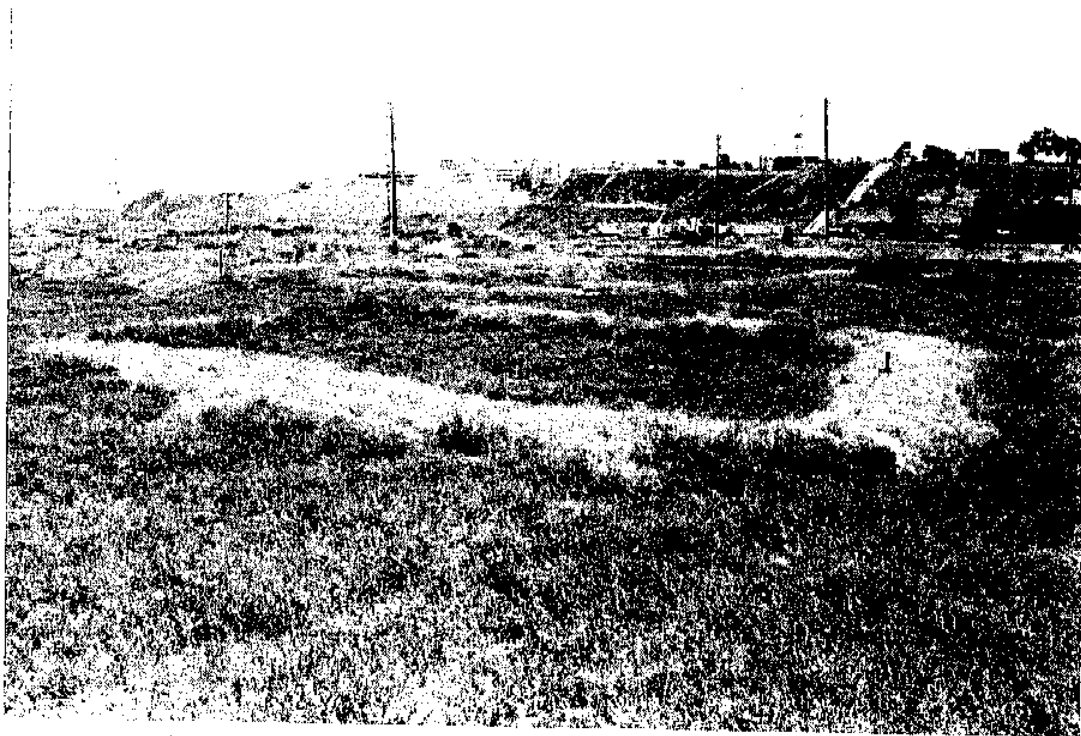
Feature 2, Berm around a Reservoir at SR2, Facing Southeast.
